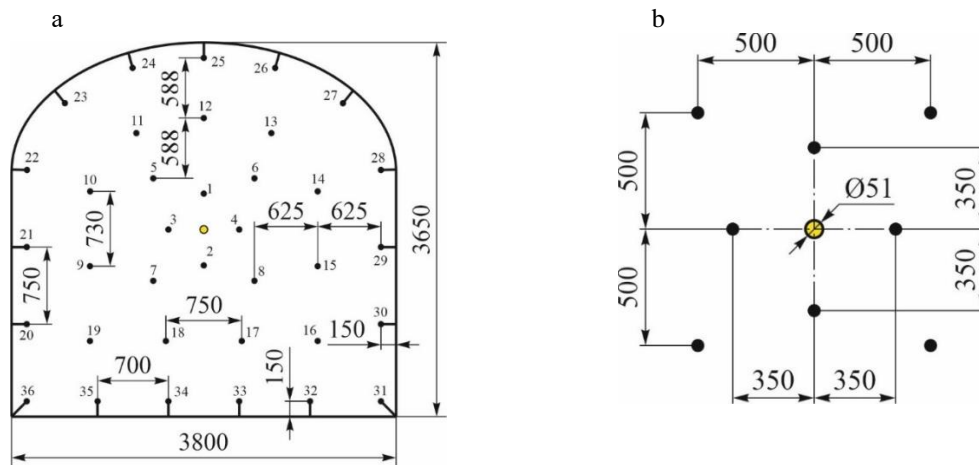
Arrangement of the boreholes in a horizontal mine working face (a) and cut design (b)
